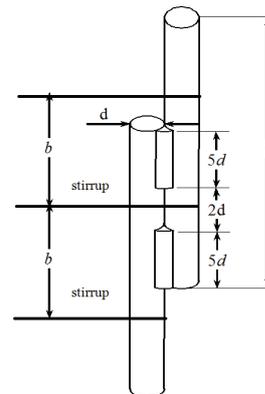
Schematic of welded lap joint of reinforcing steel specimens with stirrups
